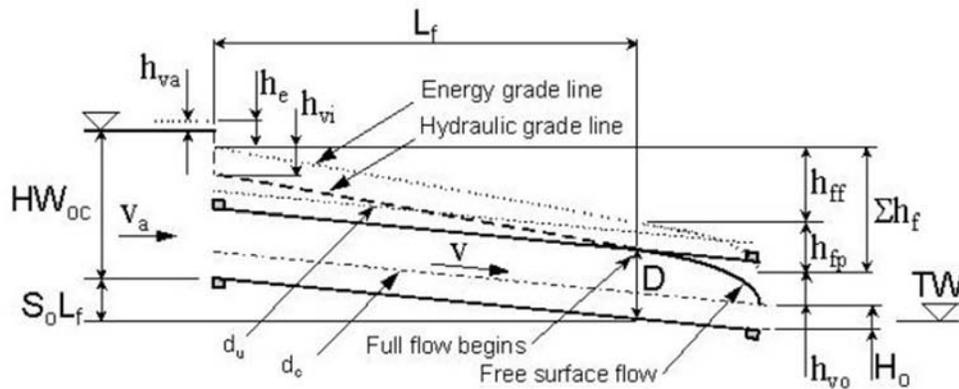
Headwater due to Full Flow at Inlet and Free surface at Outlet
